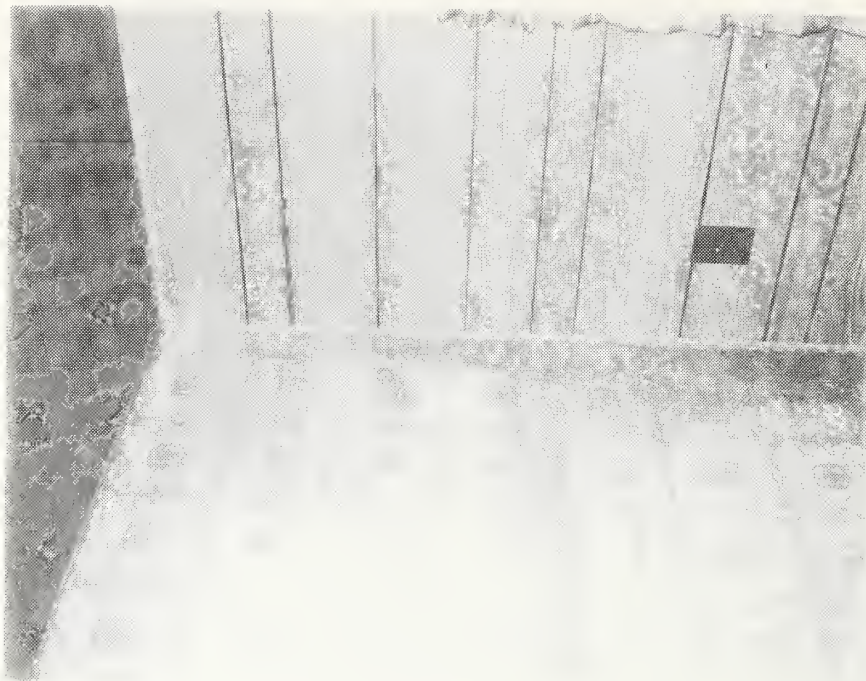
Water Staining At Wall-Floor Due to Rain Leak Through Exterior Wall
